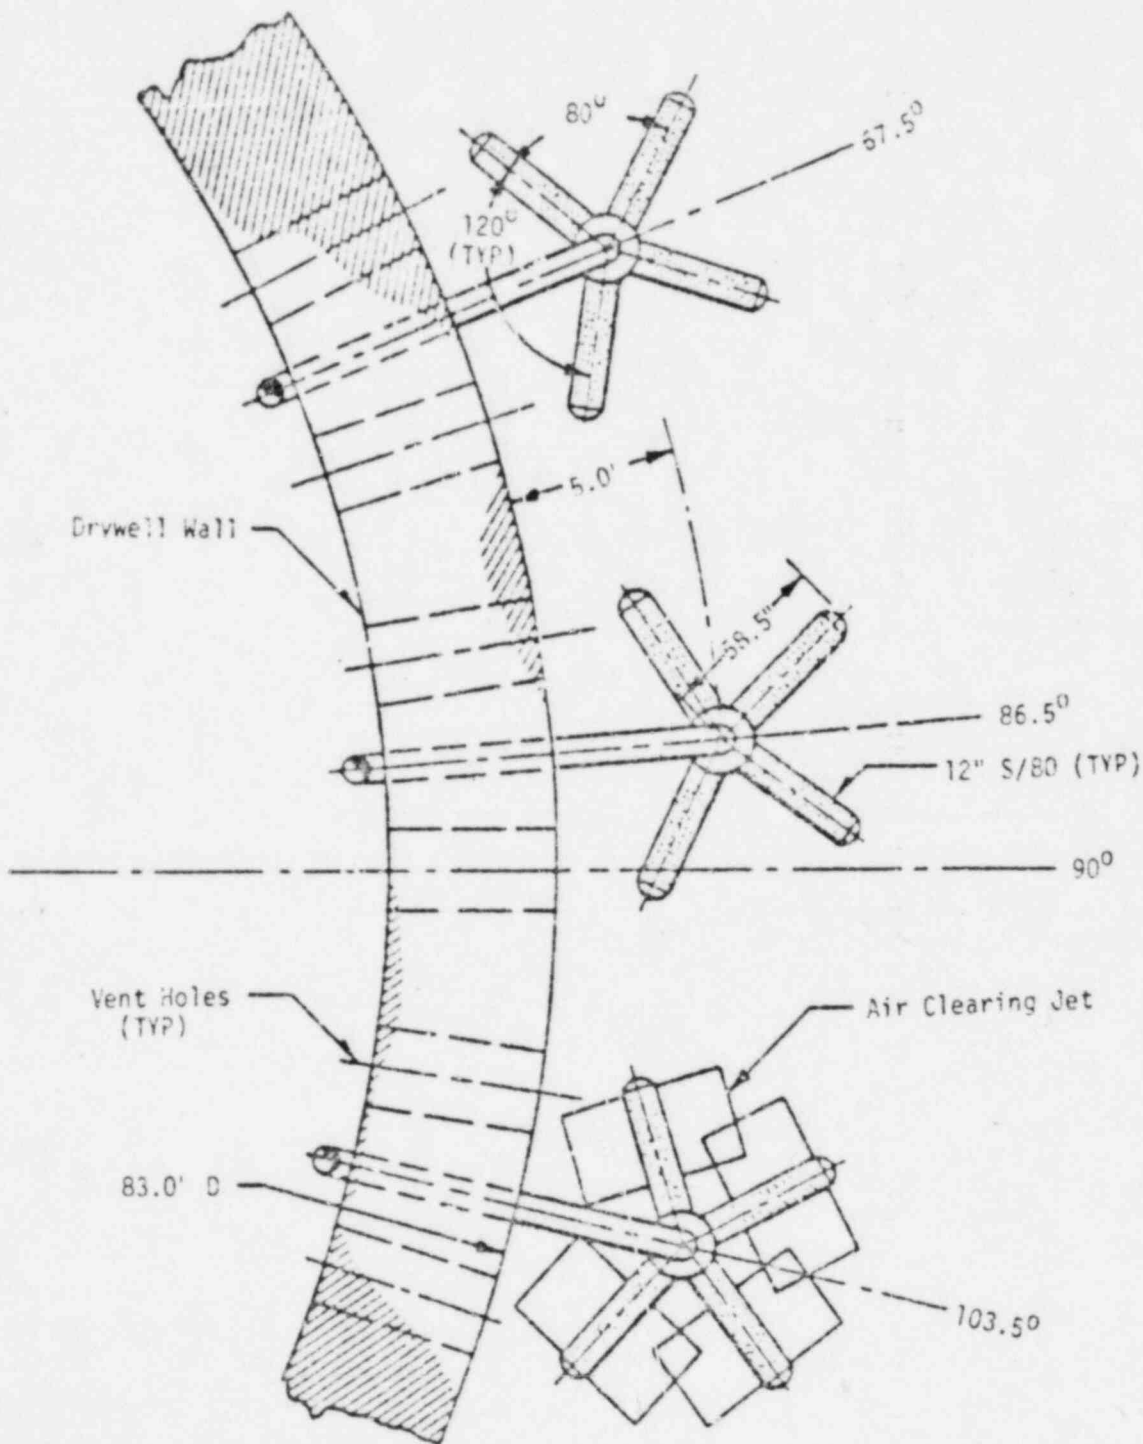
Mark III Quencher Plan View (TYP) 238 Plant Arrangement Shown
